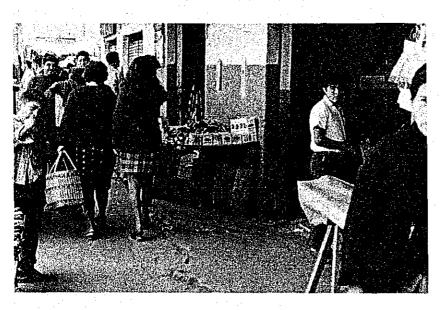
Damage due to differential subsidence of foundation of building (Casco Uabano)
